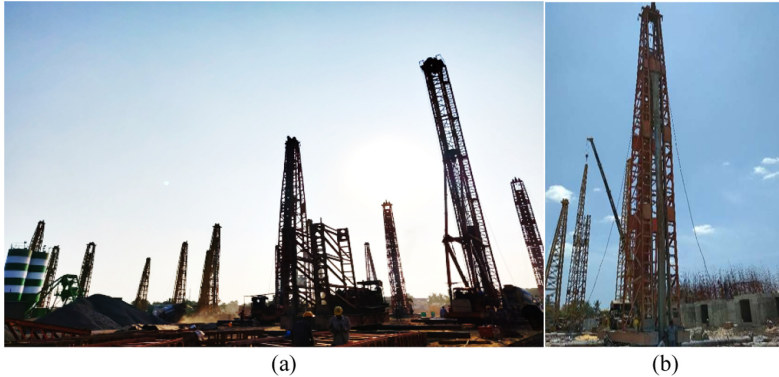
Photograph of (a) piling site, and (b) test pile driving
